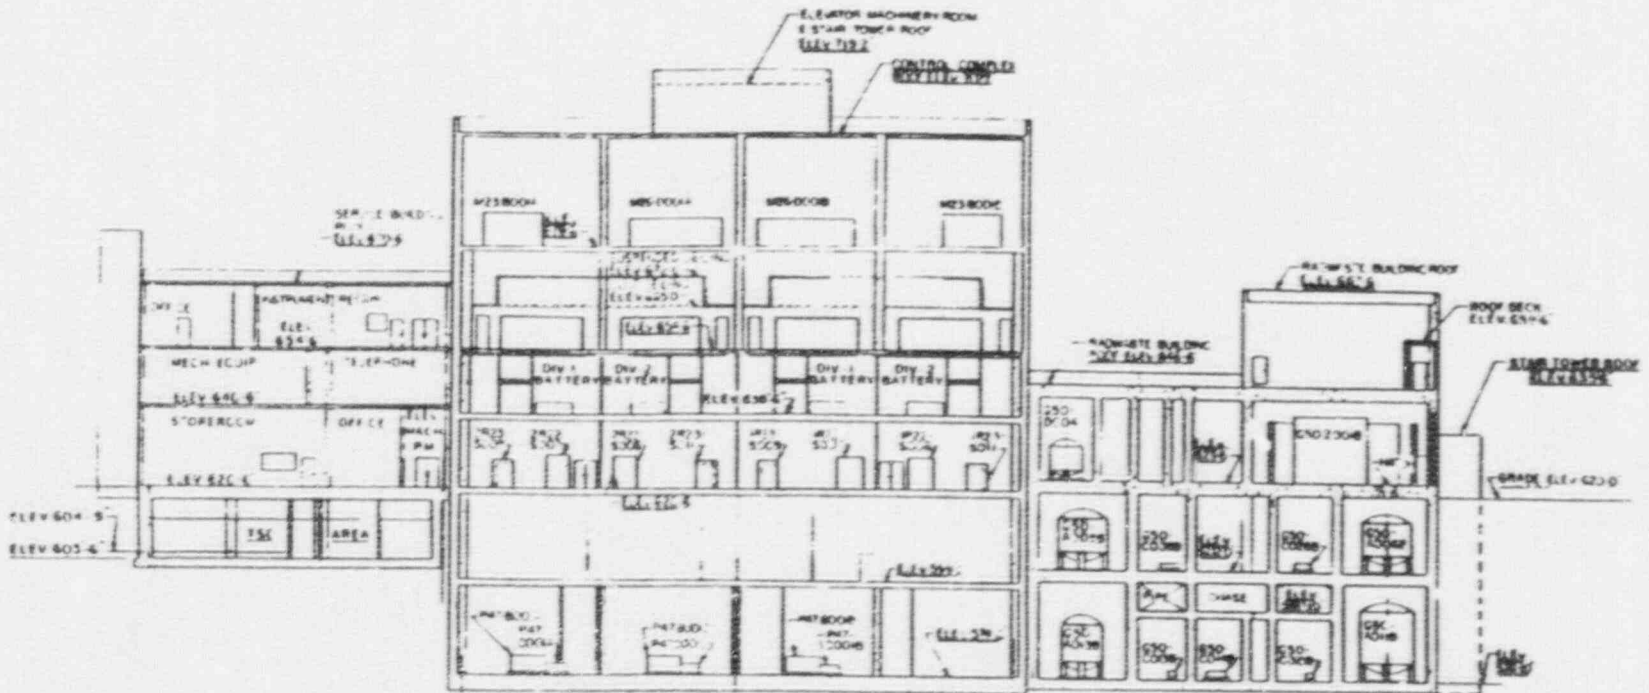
Perry 1 and 2 Service Building, Control Complex, and Radwaste Building Section, Looking West
